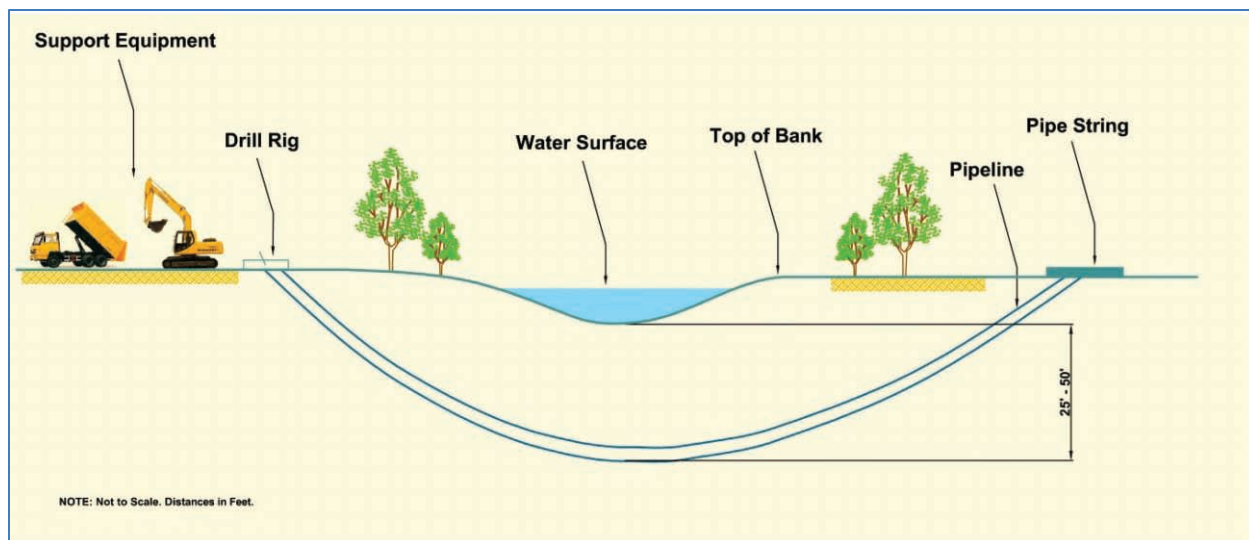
Cross Section of the Horizontal Directional Drilling Method
